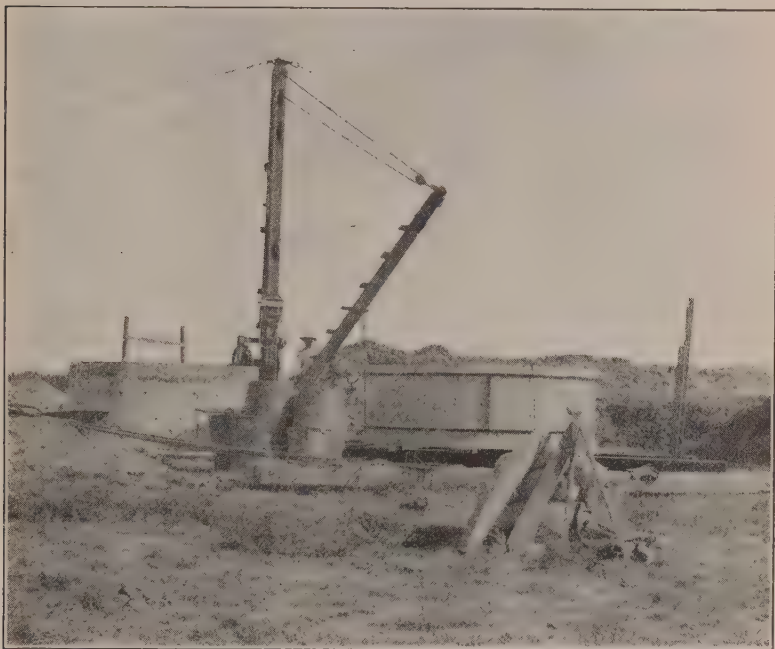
Inside and Outside Forms for Reinforced Concrete Caisson Well Curb.
